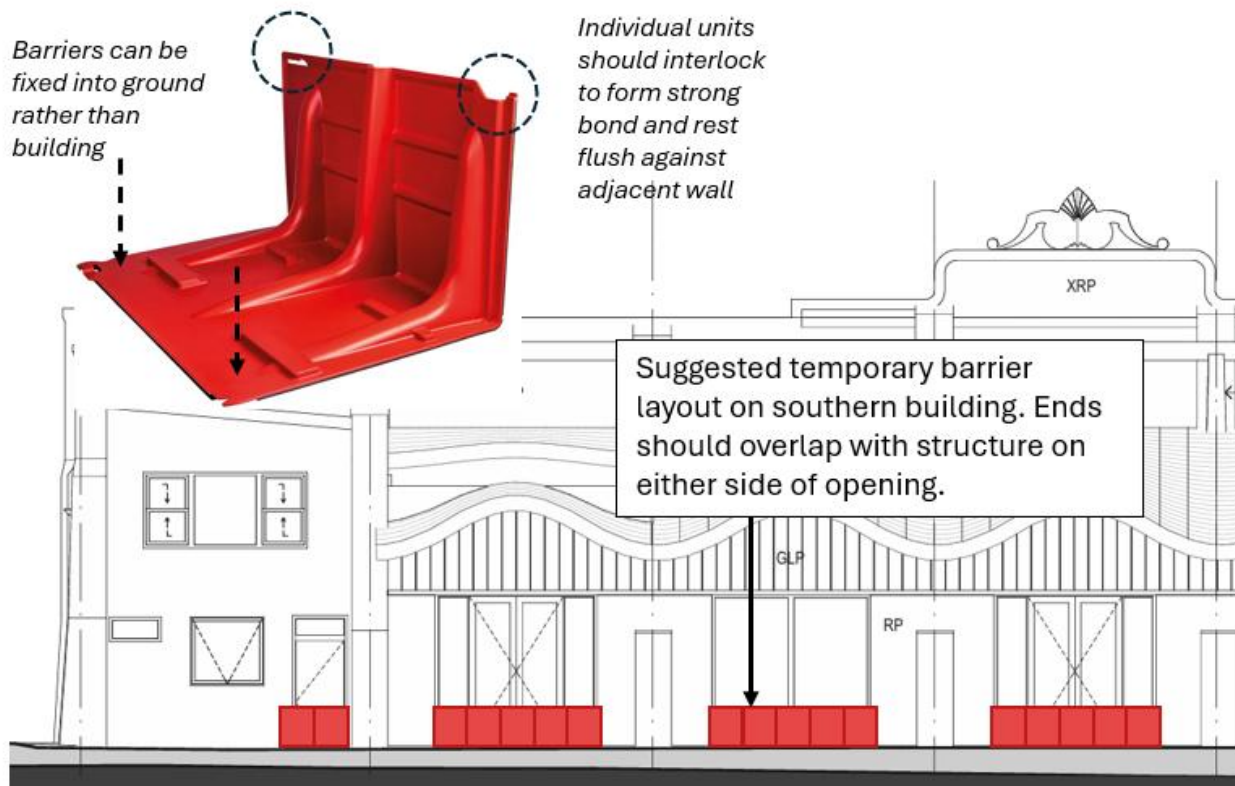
Possible temporary wave barrier layout on seaward façade of Southern building (indicative only).
